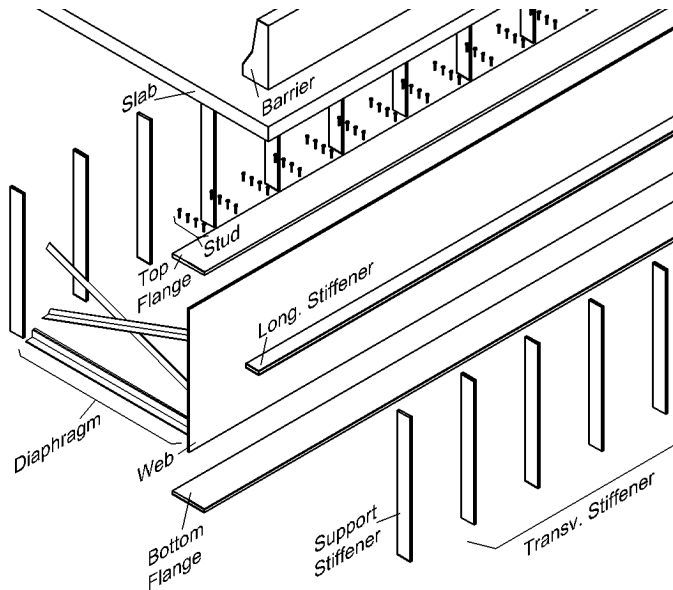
Parts of a steel-concrete composite I-girder bridge
